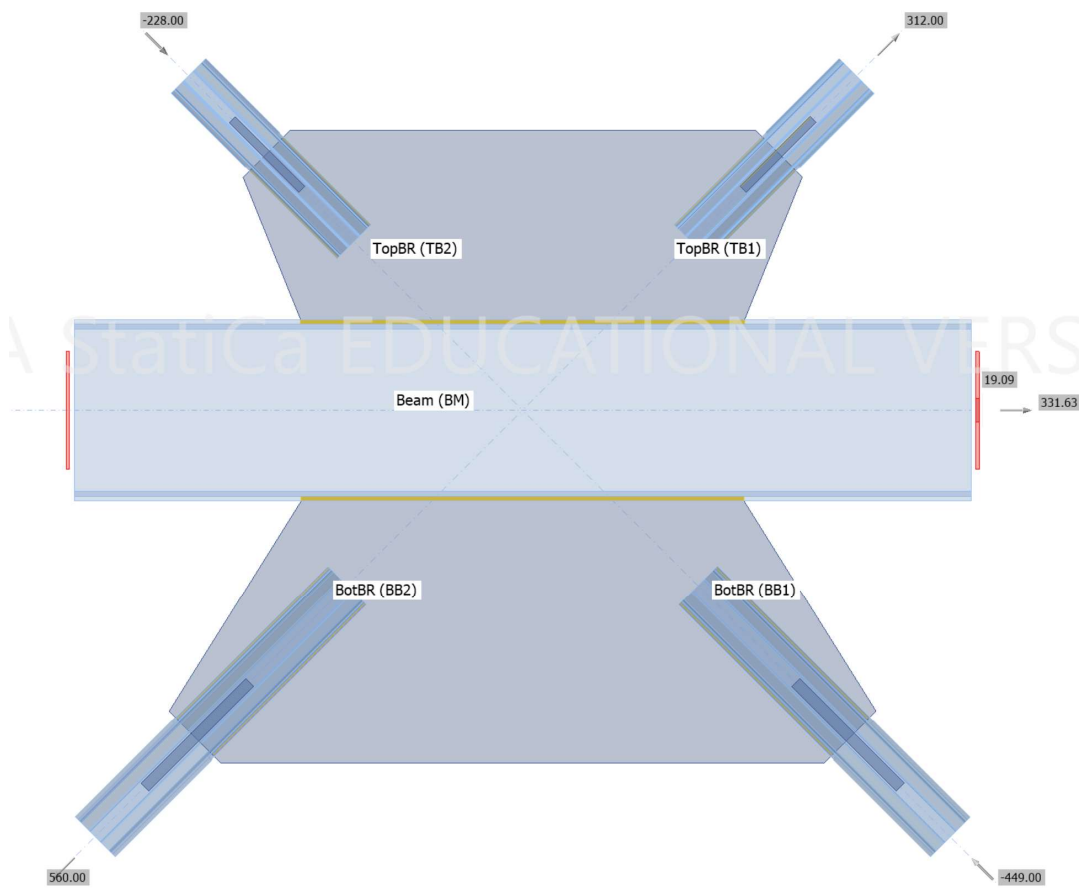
Typical HSS seismic brace connection details with the reinforcing plates on the brace member
